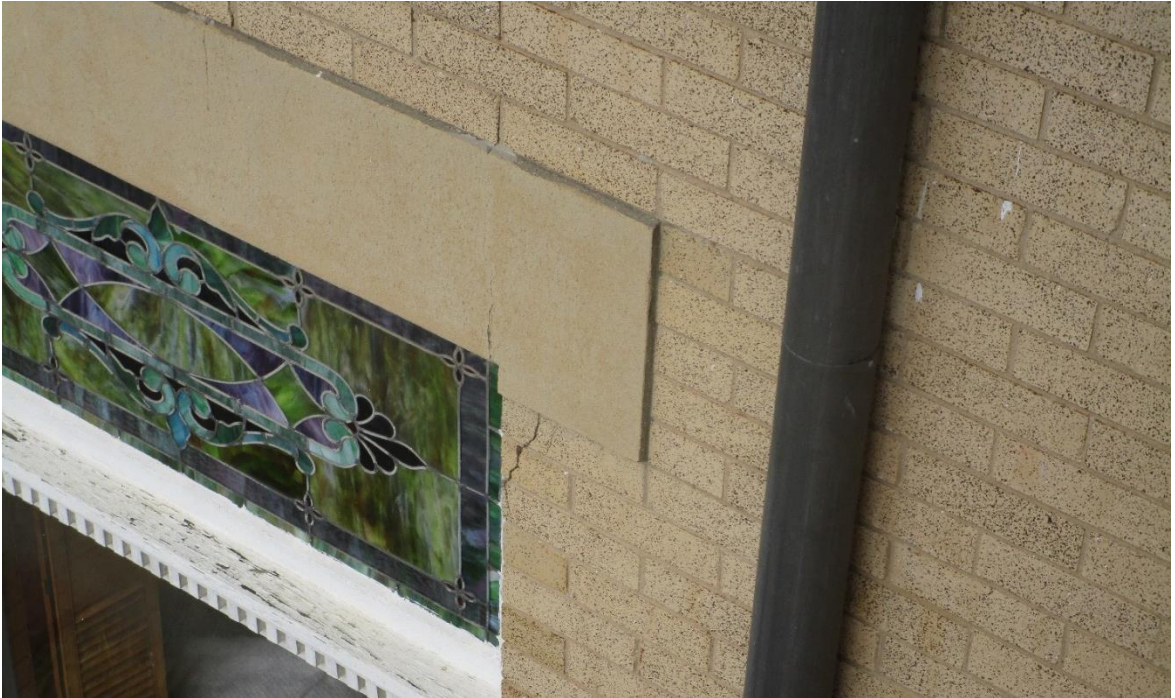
Crack in brick at the top of the window jamb for a first floor window on the south side of the building.
